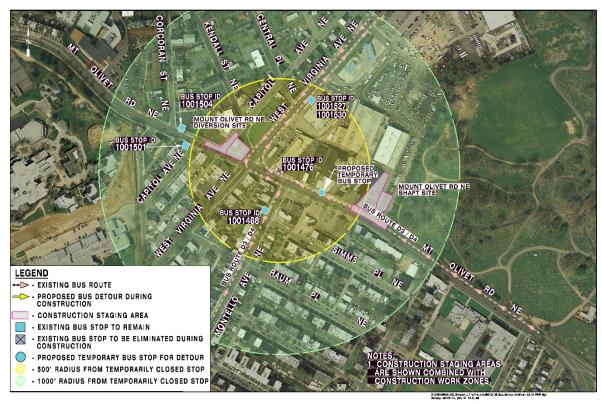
Study Area 1 – Existing Routes D3, D4 and Proximity Map to Temporarily Relocated Stop (Mt Olivet Road Site)
